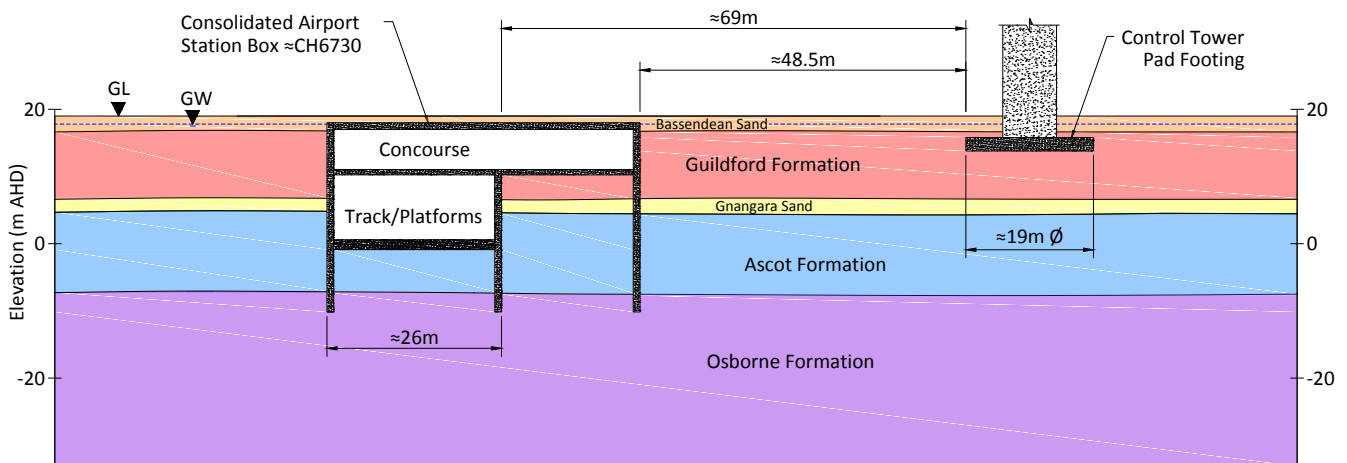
Cross section through the Airport Central Station and the Air Traffic Control tower
